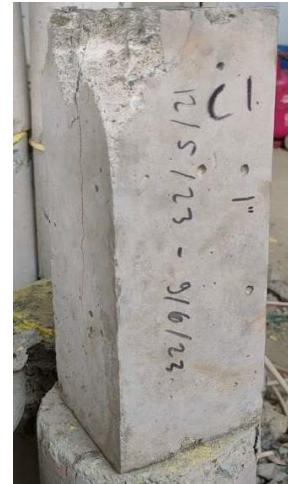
Prism Concrete With 1 inch Hole Variation Pipe Columnar Crack Type
